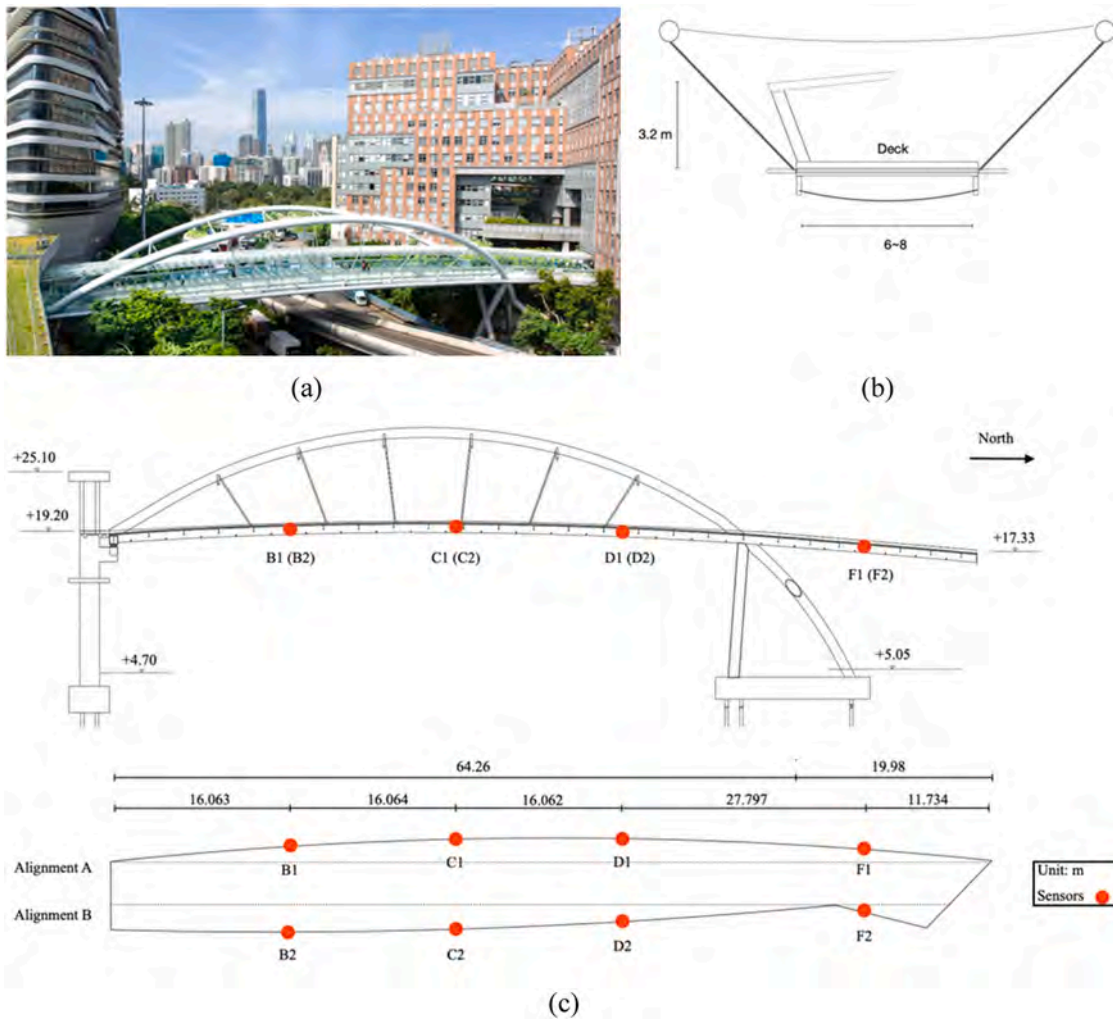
(a) PolyU footbridge, (b) cross-section, (c) side view and sensor layout.
